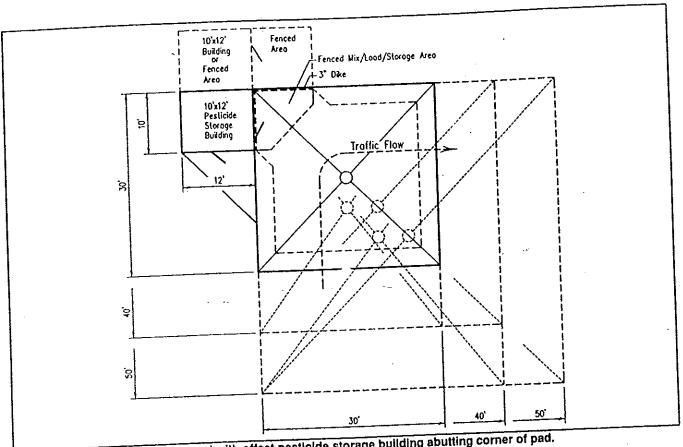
Modular mixing/loading pad with offset pesticide storage building abutting corner of pad.
